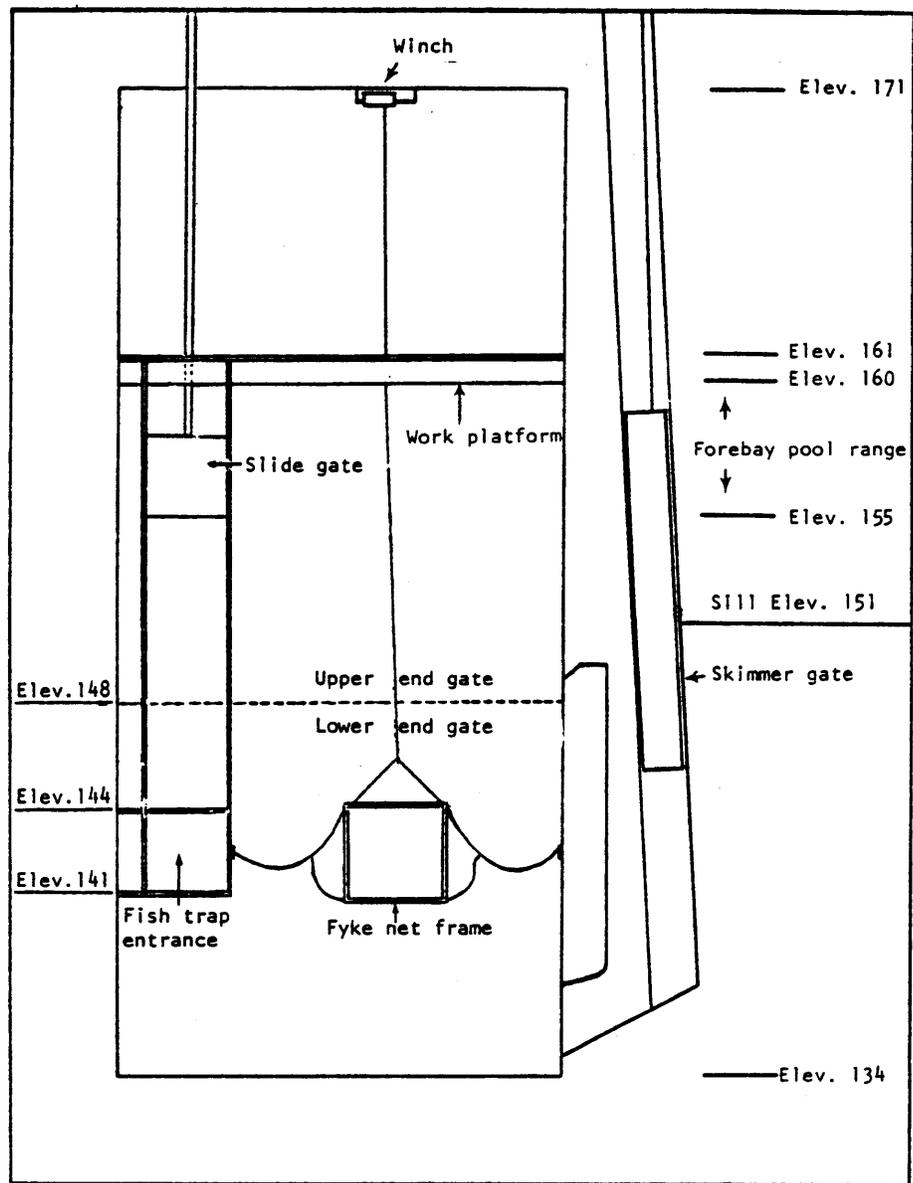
Cross-sectional view of The Dalles Dam sluiceway showing fyke net and fish trap locations (looking downstream).
